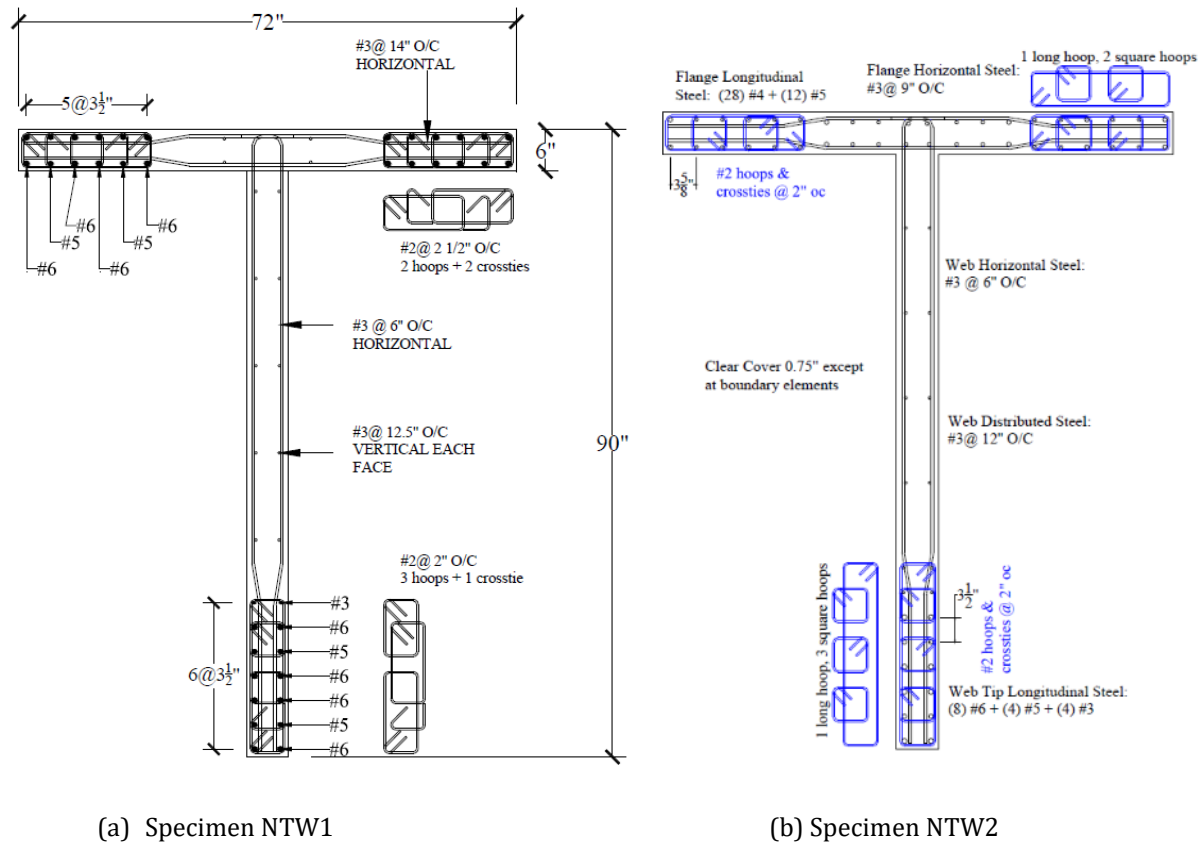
Test Specimen Geometry and Reinforcement Details for Brueggen [40]
